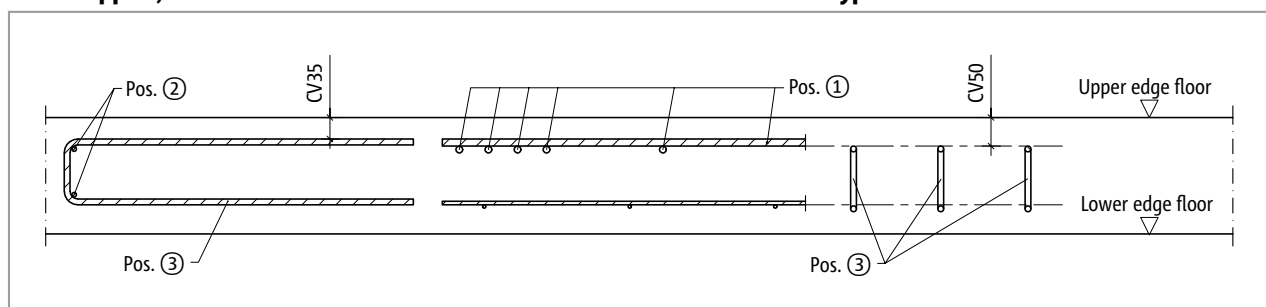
Schöck Isokorb® XT type C: On-site reinforcement outer corner (section XT type C-L-CV35, view XT type C-R-CV50)
